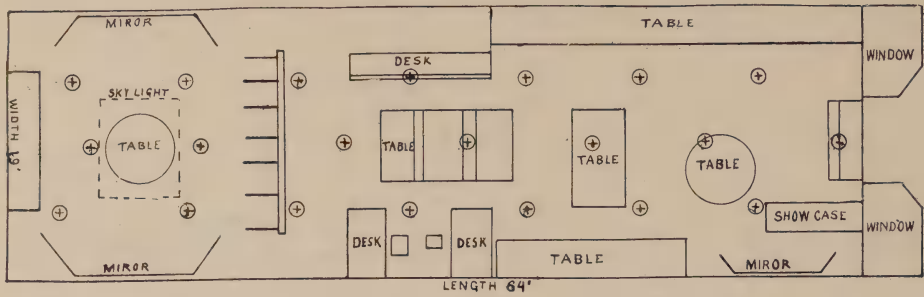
FLOOR PLAN, AND POSITION OF LAMP ON CEILING.
